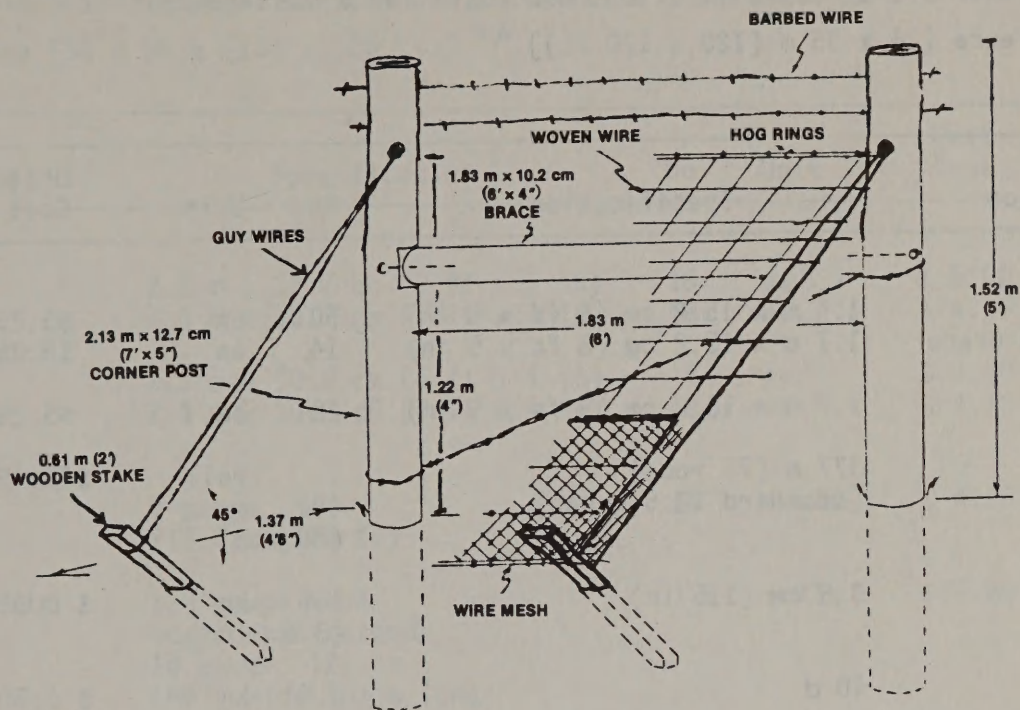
Diagonal view of slanting deer fence showing guy wire support construction (after Messner et al. 1973).
